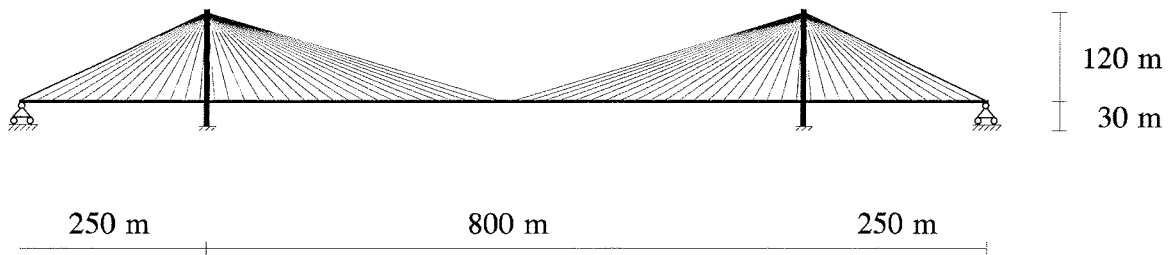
Elevation of prototype cable-stayed bridge.
